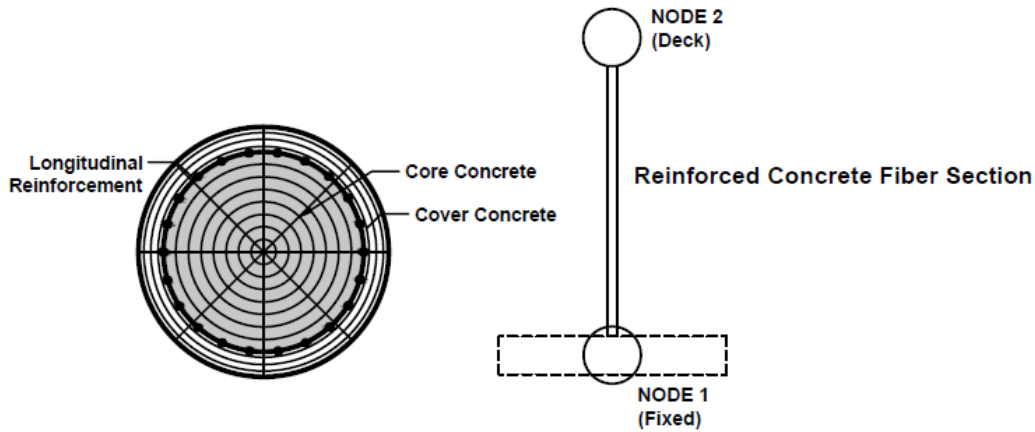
Reinforced Fiber Section and a Side Elevation of the Constitutive RC Column Model
